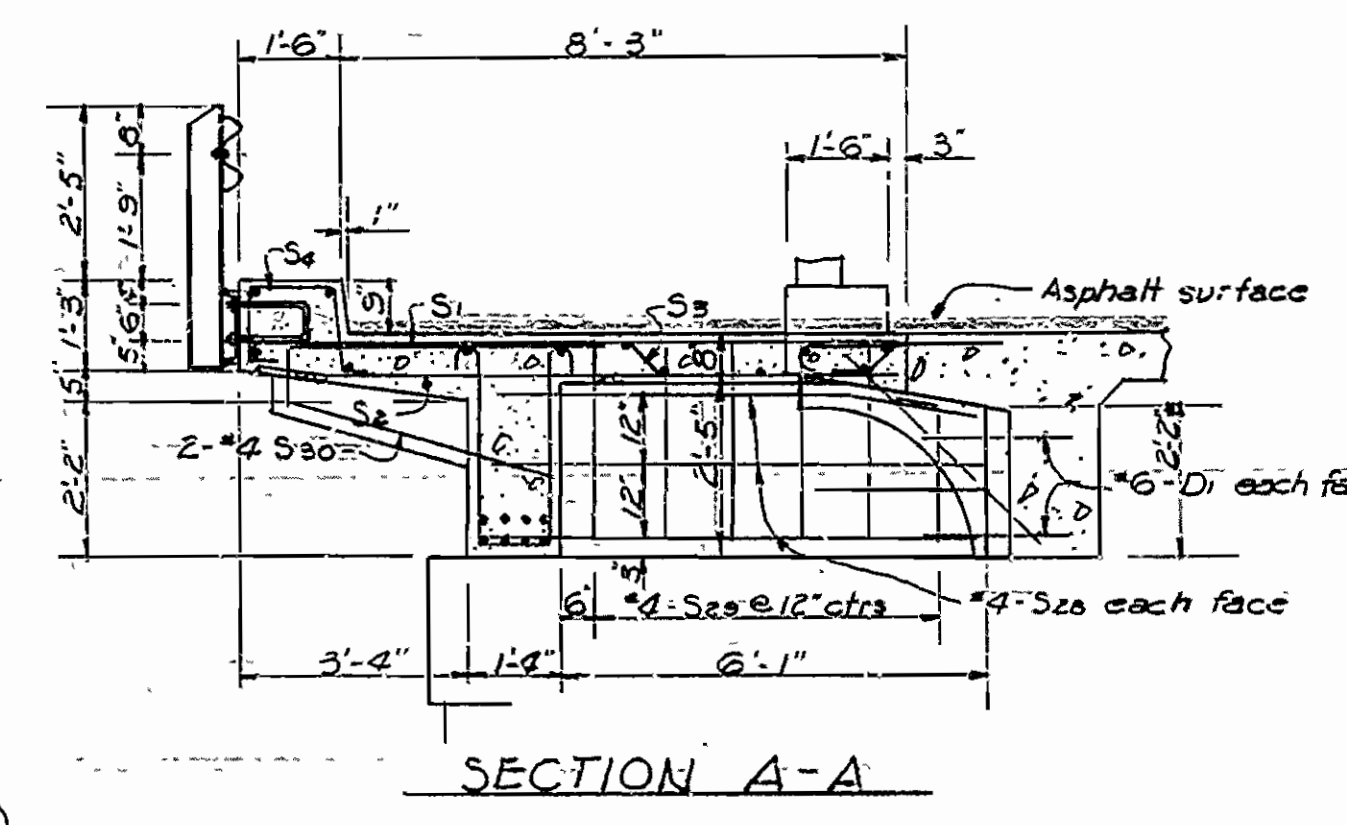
DETAILS OF EAST APPROACH BRIDGE OVER BIG CREEK ROUTE 22 SEC. 1
